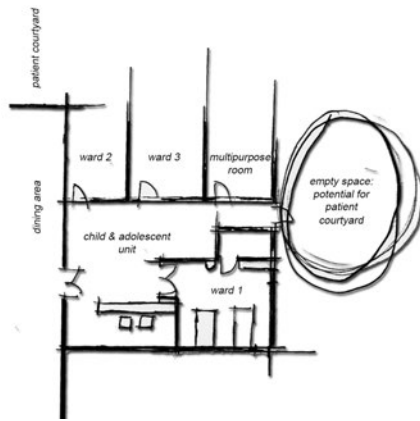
(left) : Quick sketch of the floor plan/ spatial layout of the child and adolescent unit. 2019, by Author.
